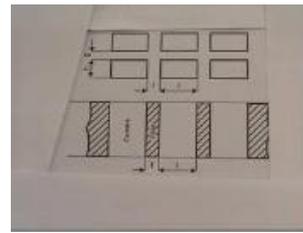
Horizontal section through the chamber-rectangular pillar system
